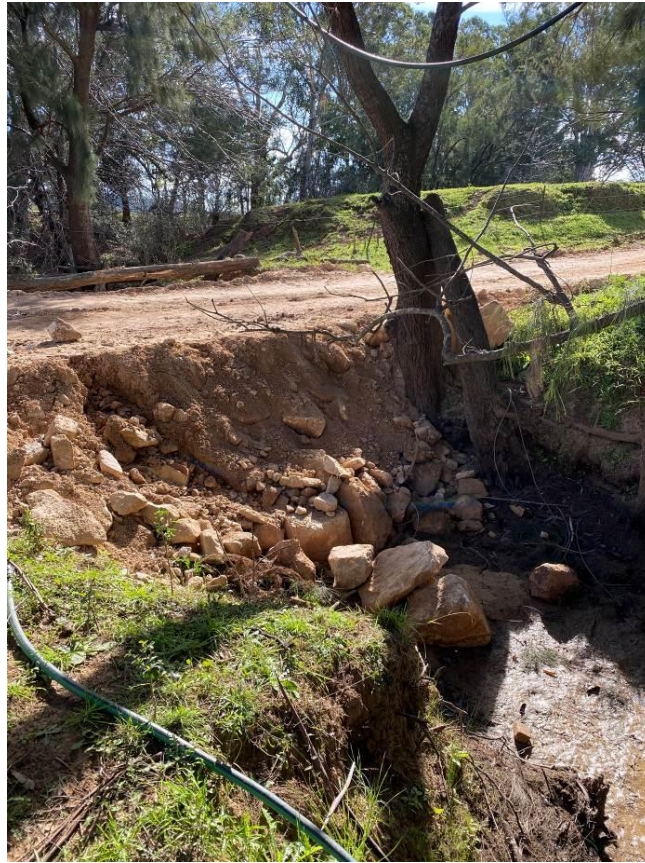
Duncans Creek existing sandstone road across creek – photo taken facing downstream
